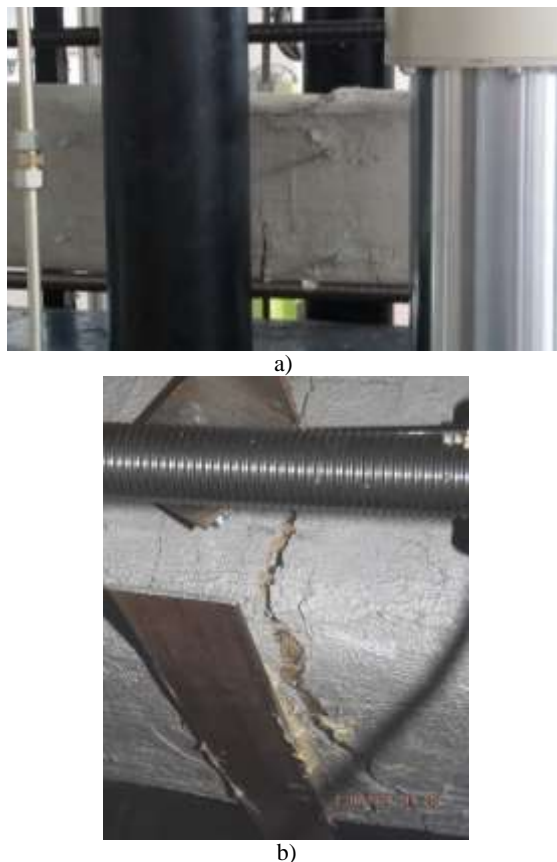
Q15F2-1 specimen at the failure: a) midspan section; b) bottom face
